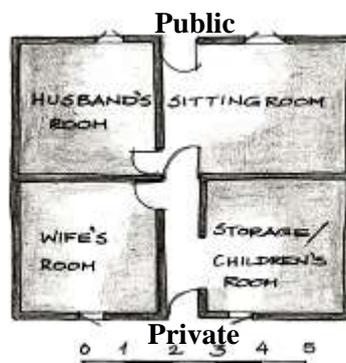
The floor plan of the house in figure 1, Mbuya. (Sketch: Nnaggenda-Musana, 2004).
